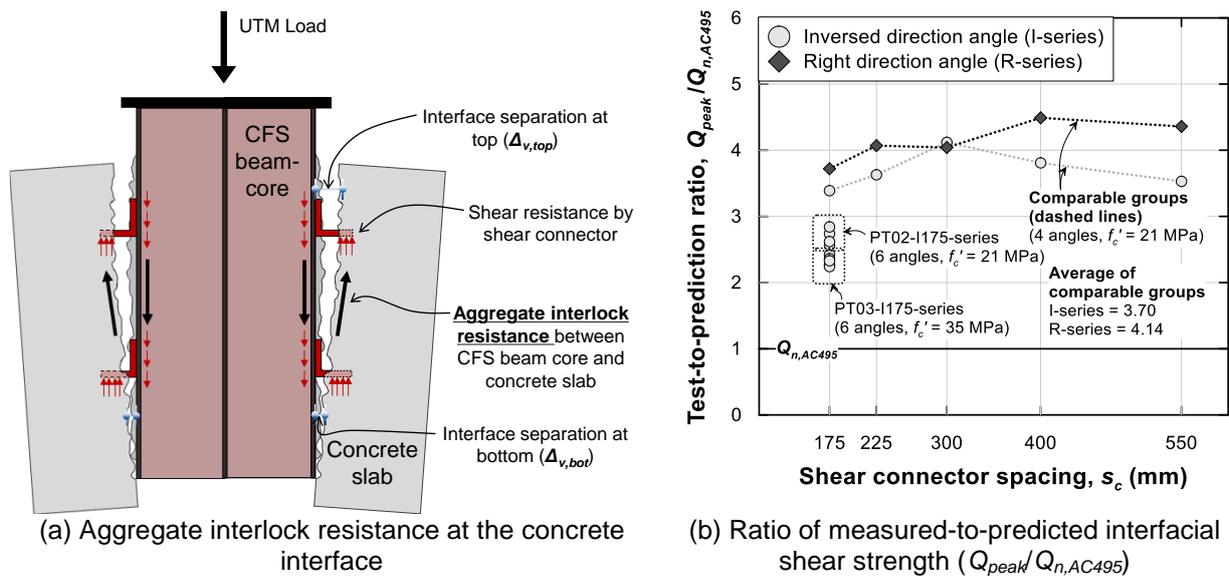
Interfacial shear strength evaluation of angle shear connectors welded to U-shaped steel beam
